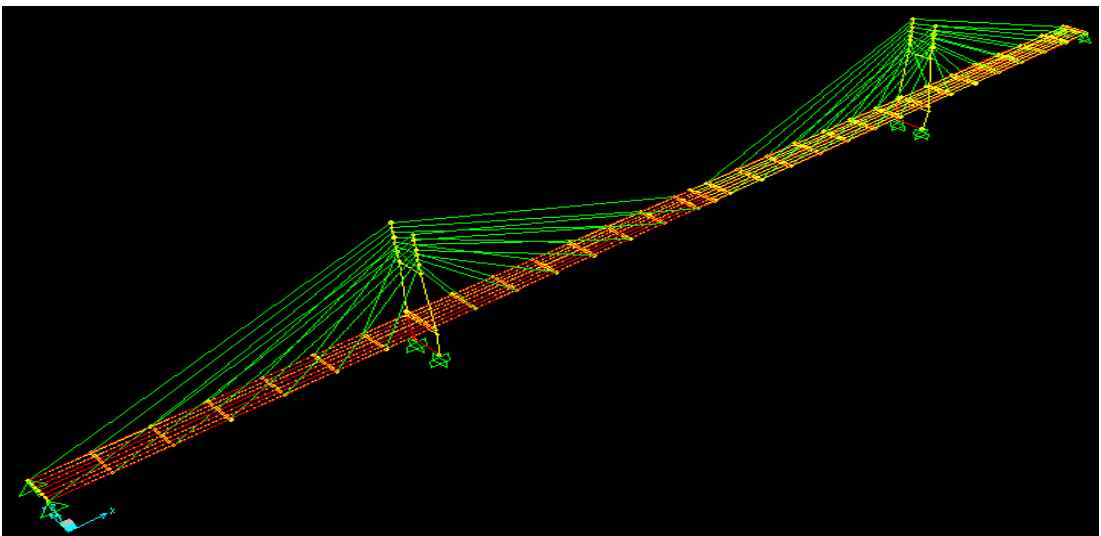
3-D finite element model of H-shaped pylon cable-stayed bridge
